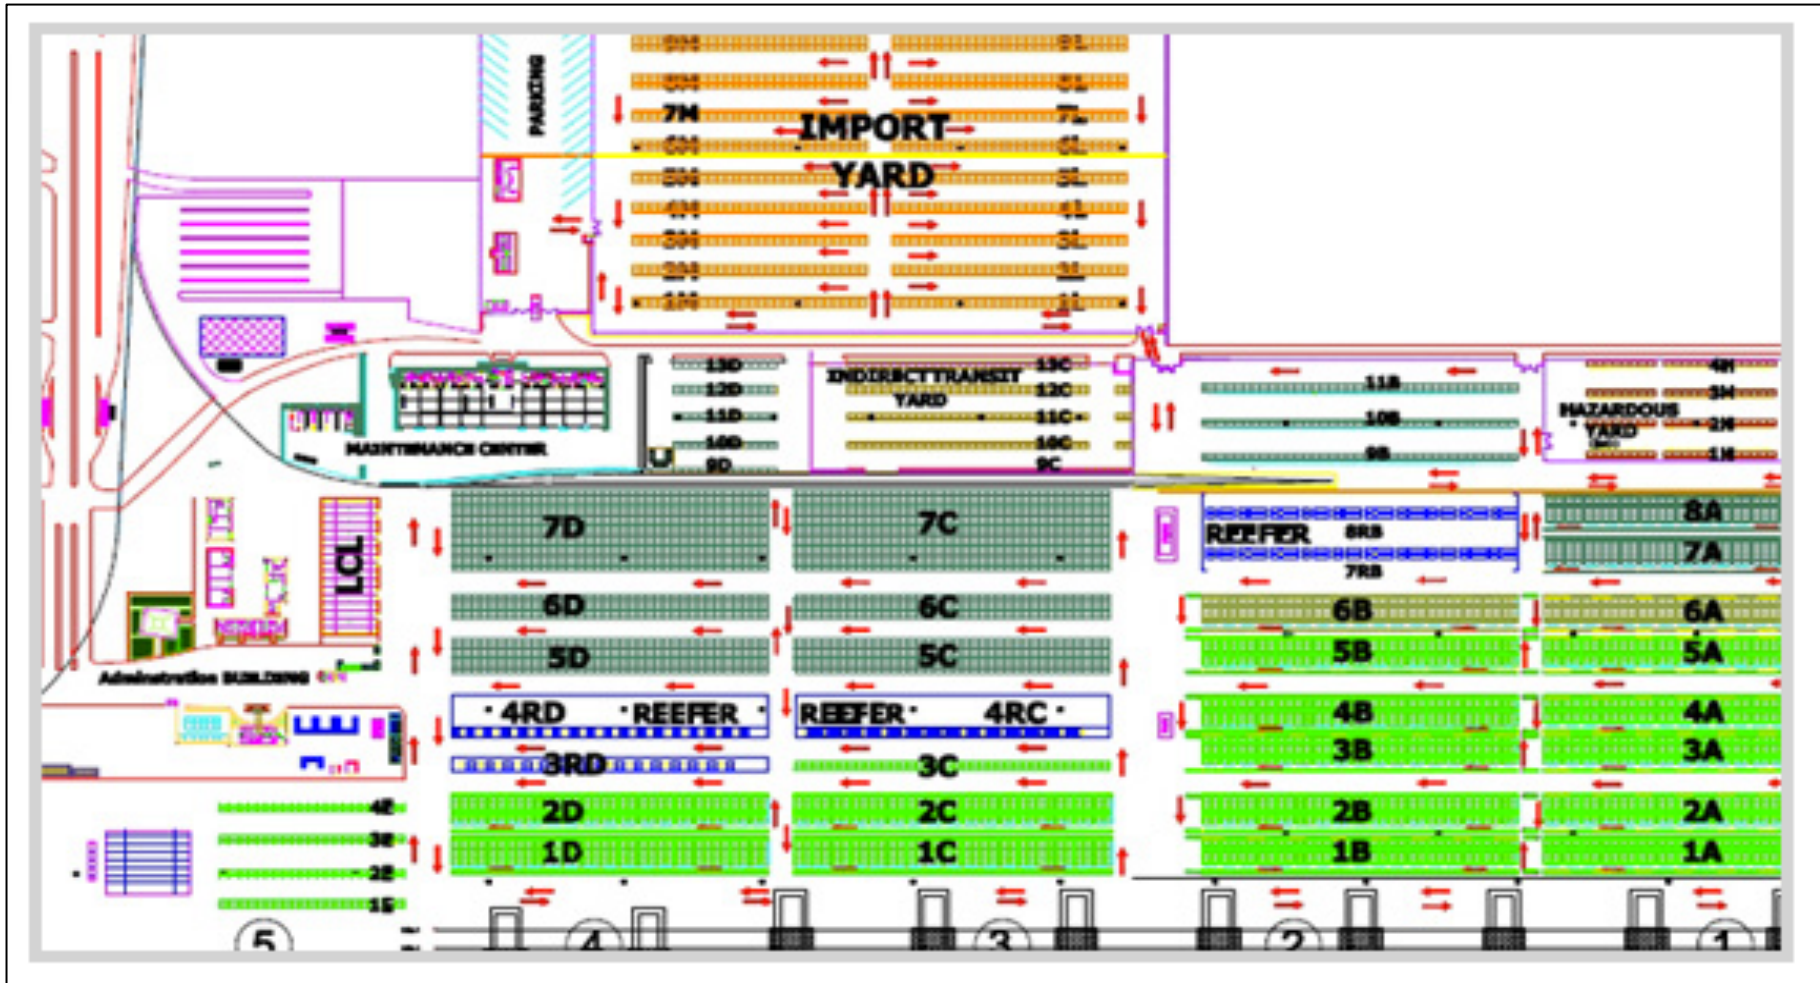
Damietta container terminal layout (Source: DCHC, 2015)
